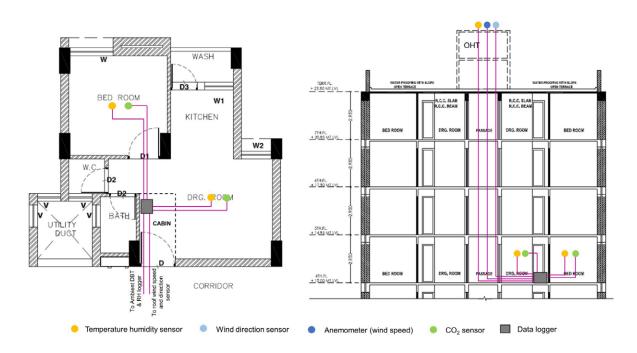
Plan and section of the test flat showing location of sensors and loggers
